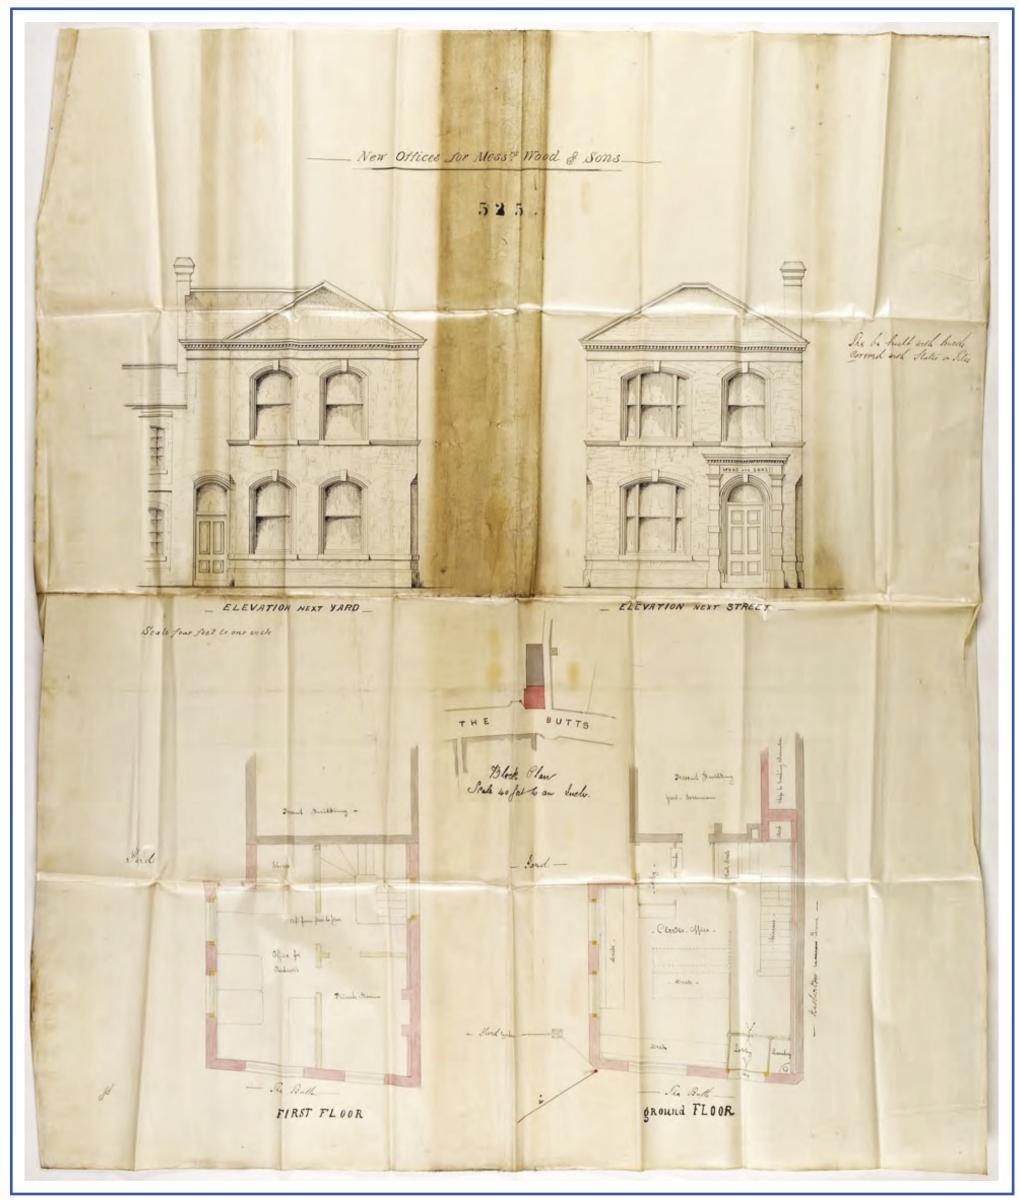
Plan from property enfranchisement (WRO ref 496.5 BA9360/Cab14/15/A) Figure 26
